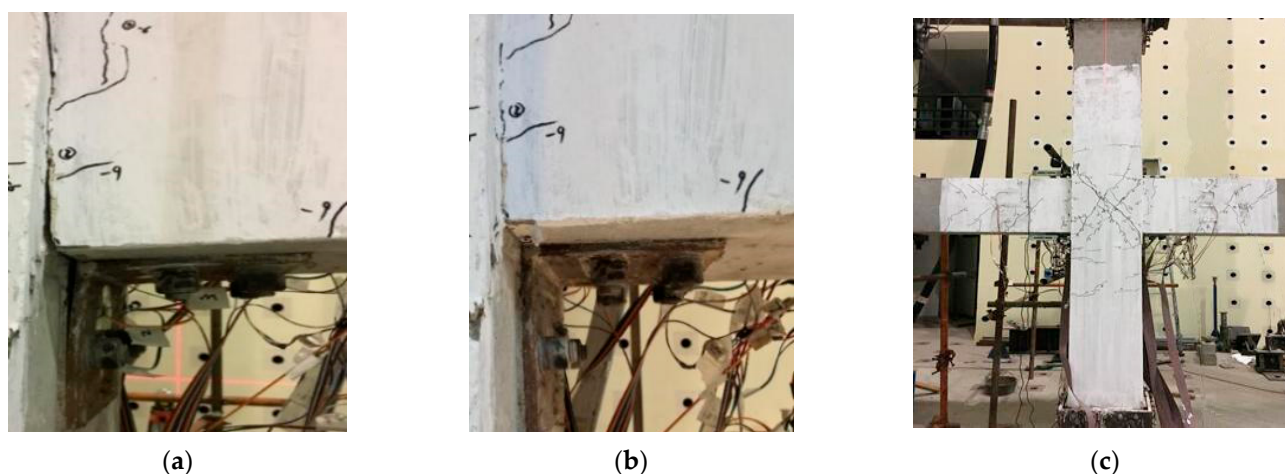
Crack pattern and failure mode of the PC connection: (a) crack at the beam end; (b) failure mode of the PC connection.
